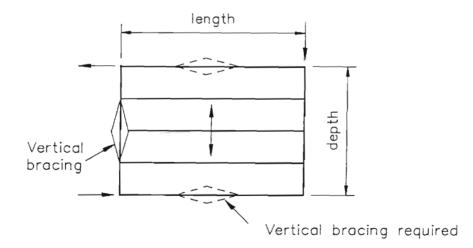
Cantilevered diaphragm: sheeting spanning perpendicular.
